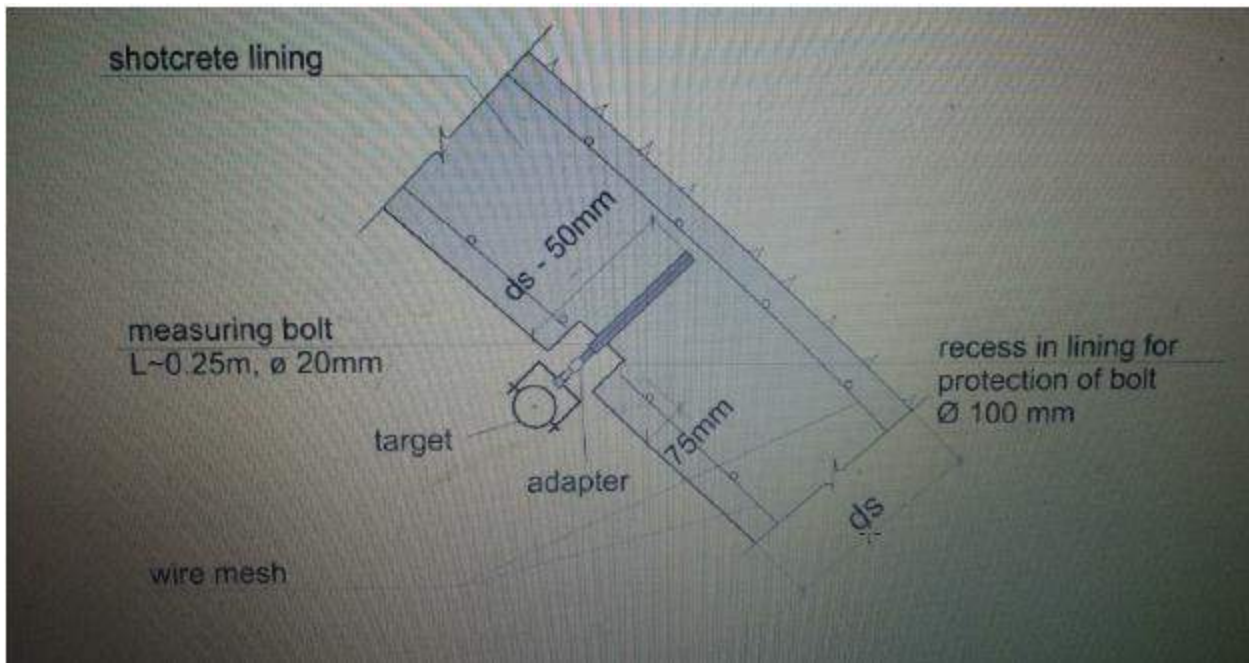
Sketch of monitoring bolt unit mounted in shotcrete lining [27]
